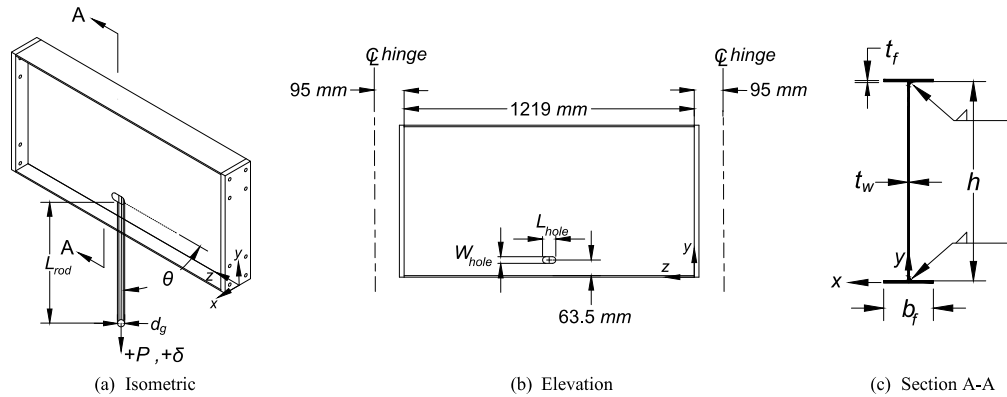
Metal building primary frame steel plate girder specimen dimension nomenclature.
